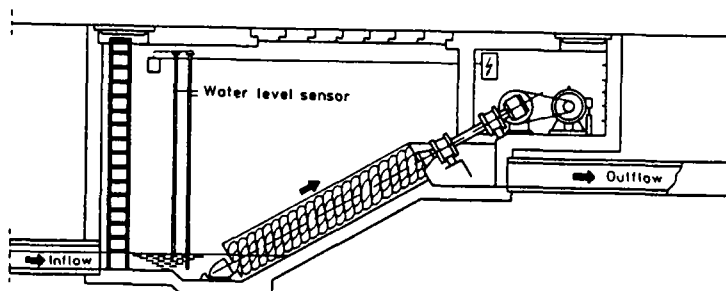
Basic sewer pumping station layouts (ATV, 1982b)
